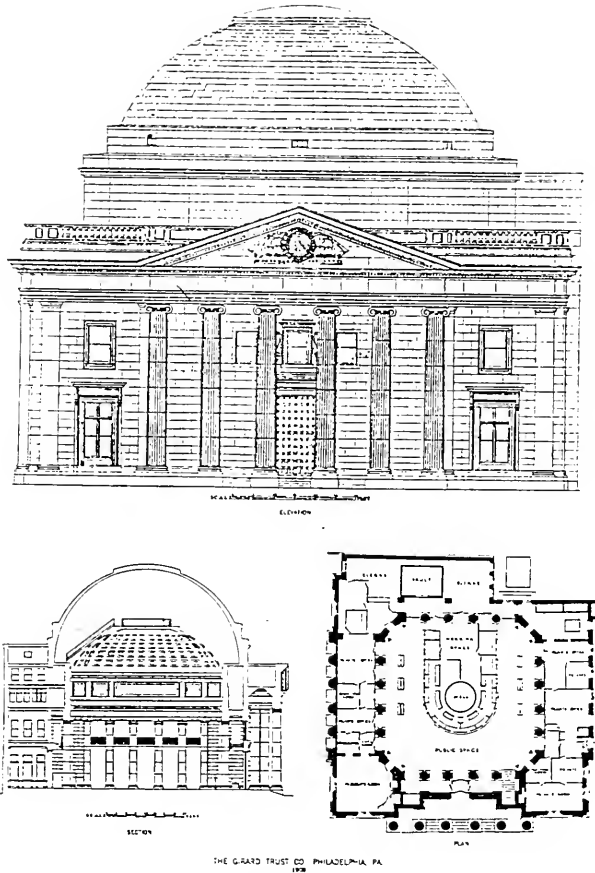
Girard Trust Bank: Plan, Section & Elevation [A Monograph of the Works of McKim, Mead & White: 1879-1915 (New York: Da Capo Press, Inc., 1985), pl. 330.]
